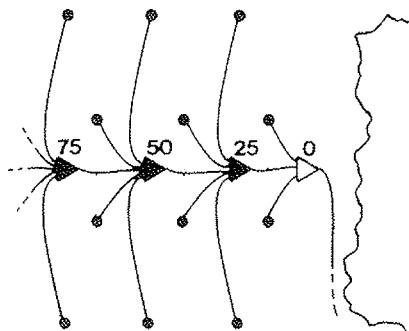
26 Connection of trench blasting round with NONEL UNIDET.
